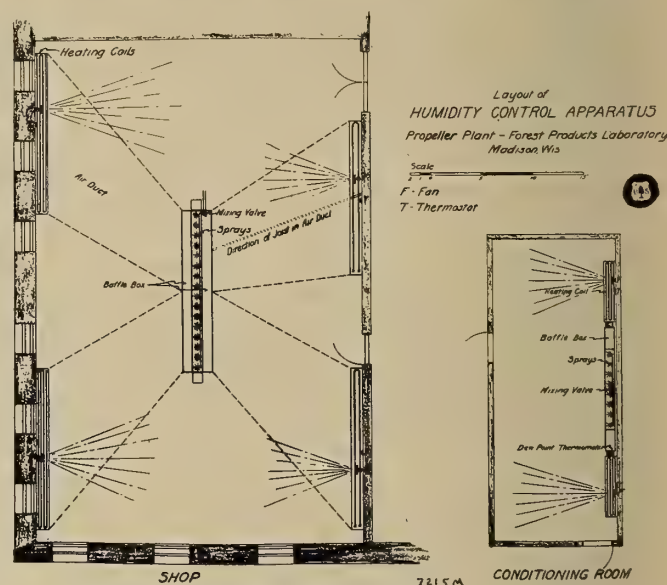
PLAN OF SHOP AND CONDITIONING ROOM
